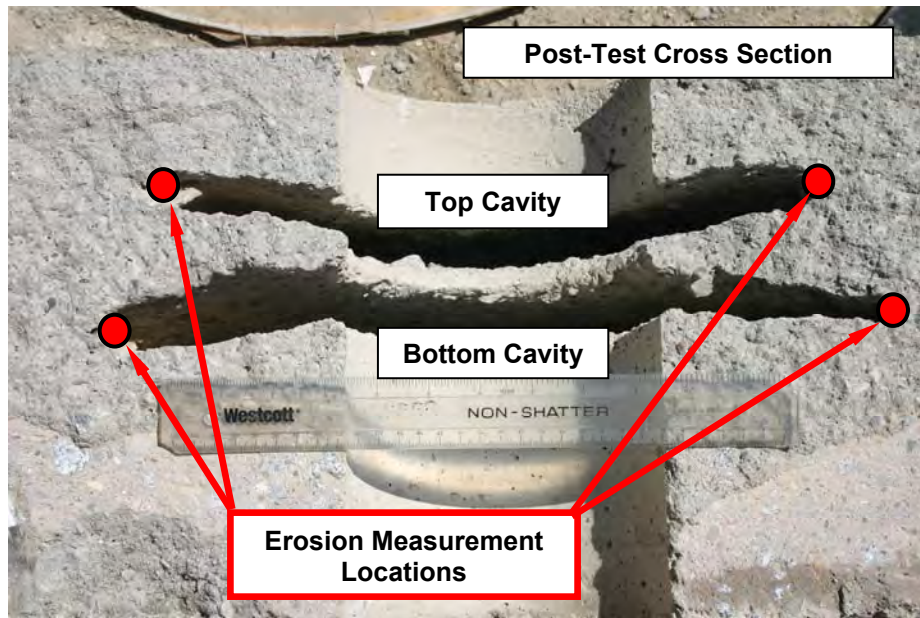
Post-Test Photograph of the 6-inch Diameter Ring Sample, SCM-01 Test Series; Erosion Measurement Locations Noted
